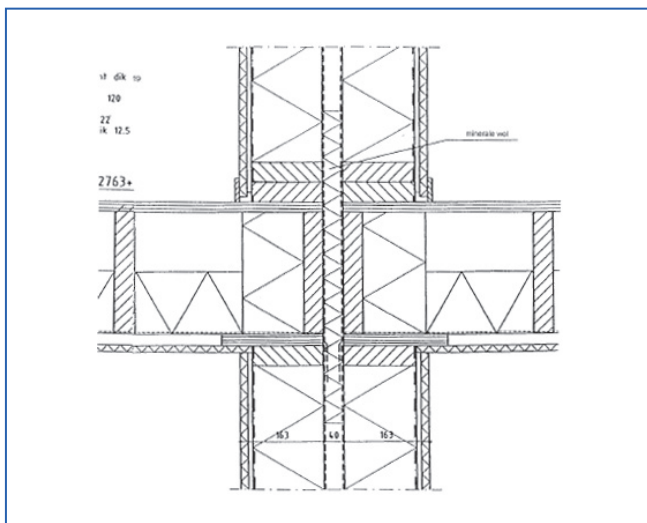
Timber based building with cavities of 200 till 300 mm detail of first floor see (SBR 2003) for Class 3 and class 2 (NEN 1070:1999) [[2] - (Netherlands)].
